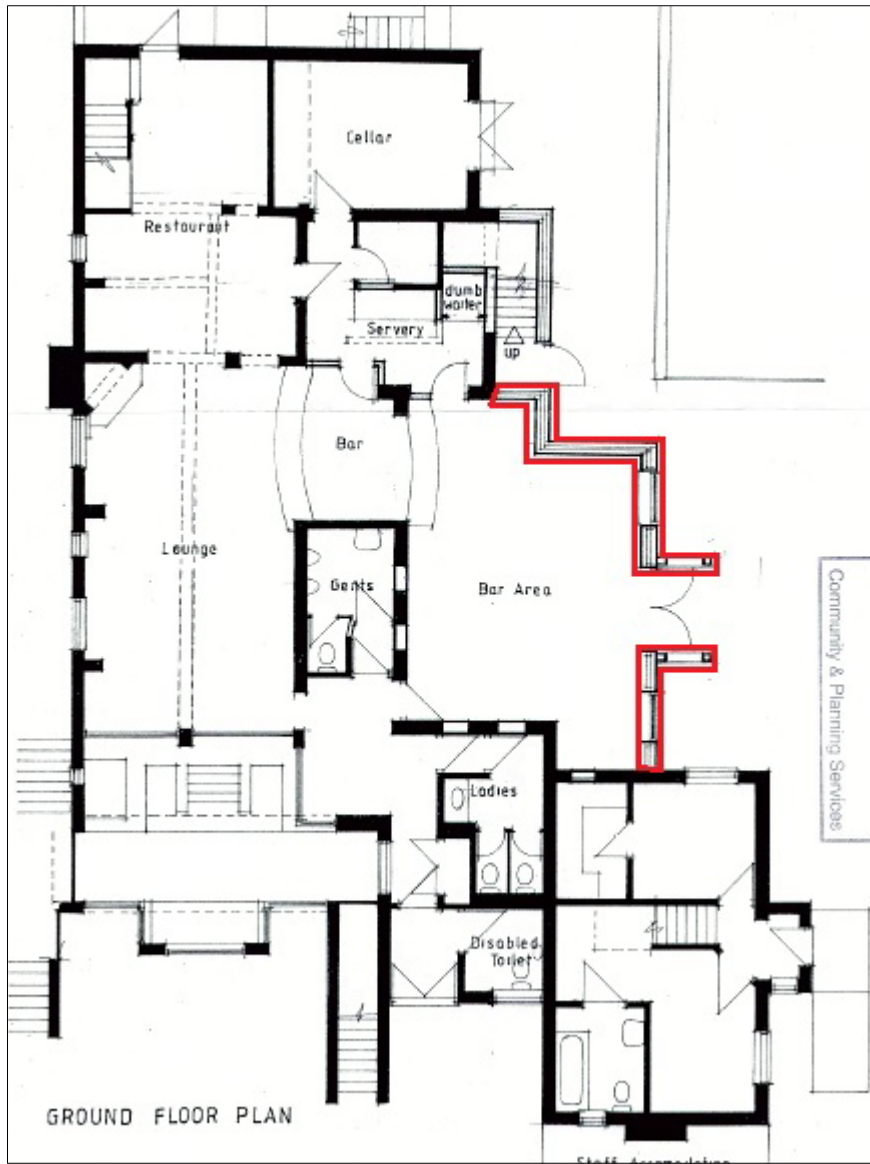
Floor plan of existing building with position of foundation trench outlined in red (provided by client)
